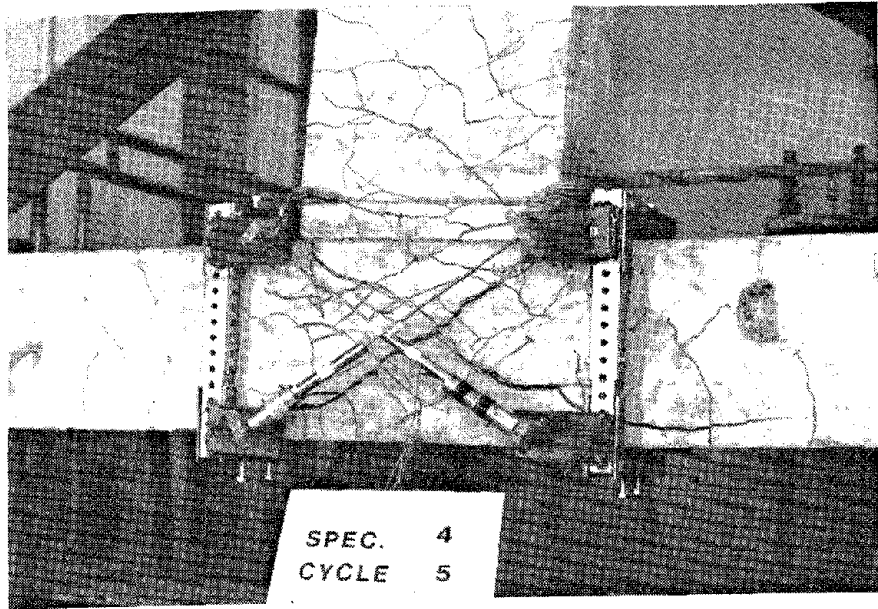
Cracking Pattern on the Joint of a Bare Specimen.
